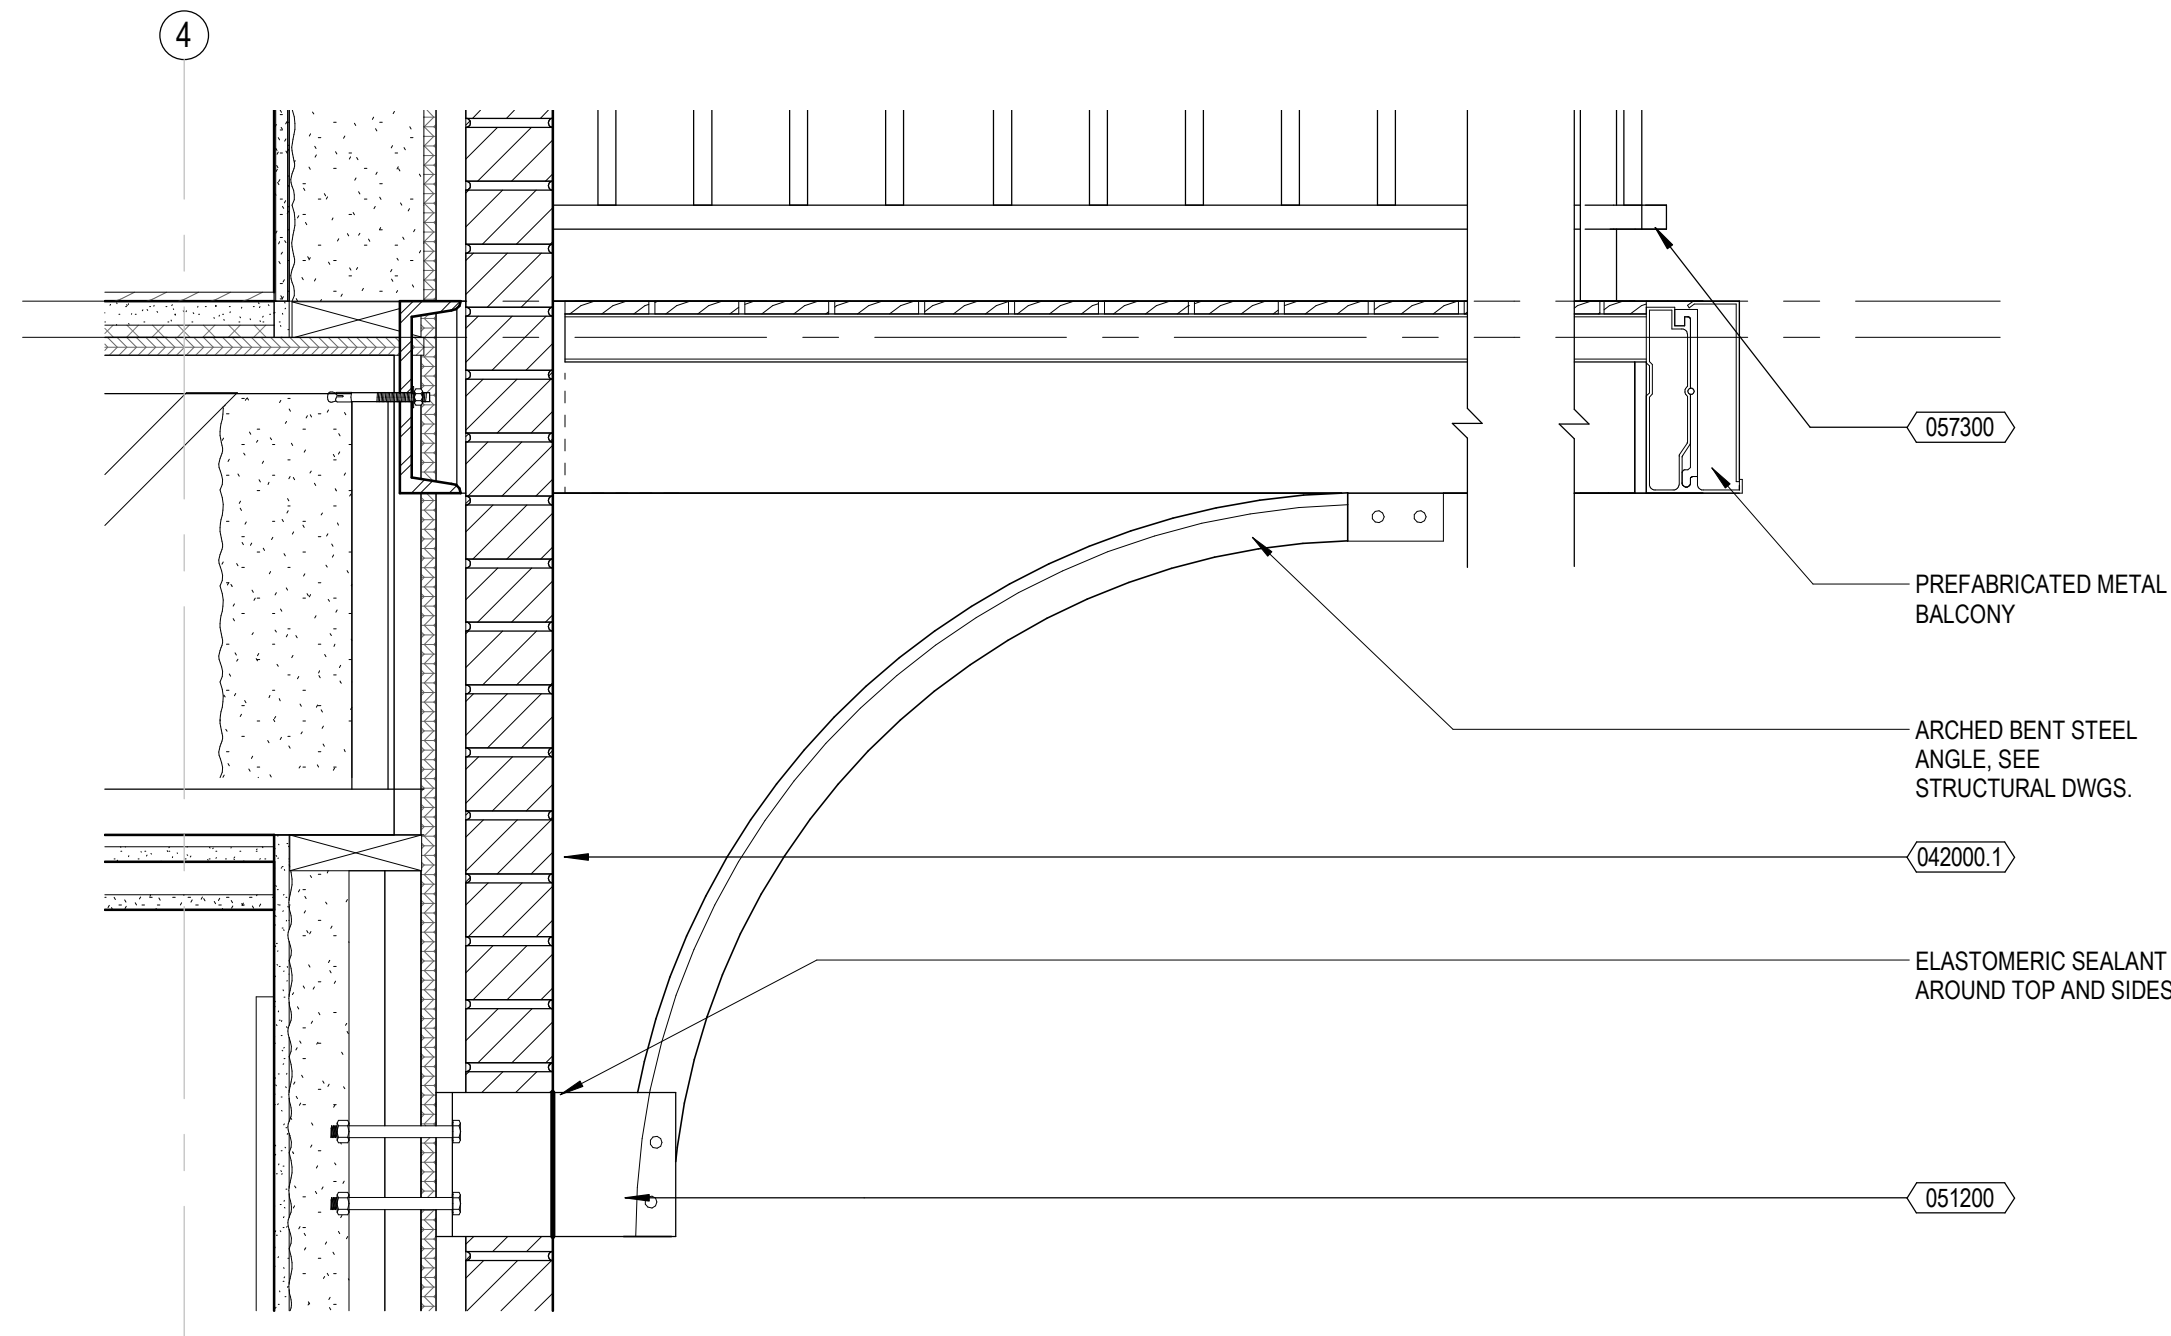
DETAIL- JULIETTE BALCONY CONNECTION AT WOD FRAMING
